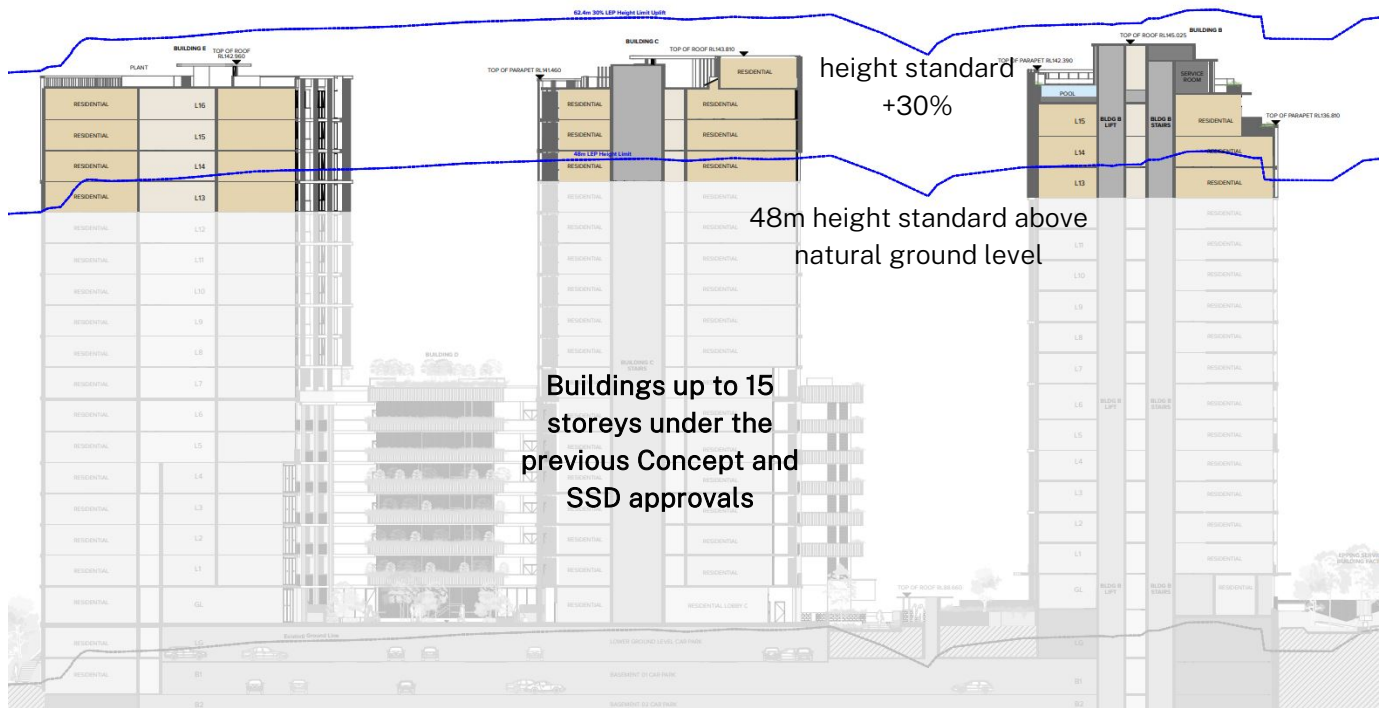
| Section through Buildings B, C and E showing additional levels (Source: Applicant's EIS)
